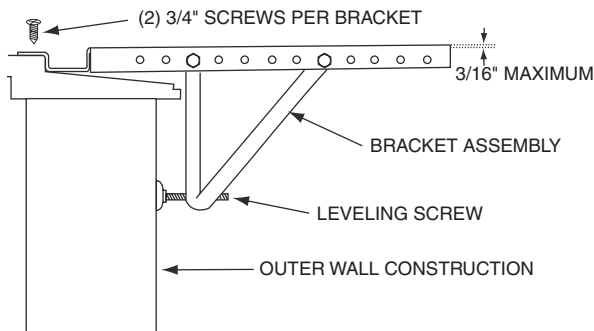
BRACKET LOCATION AND INSTALLATION
